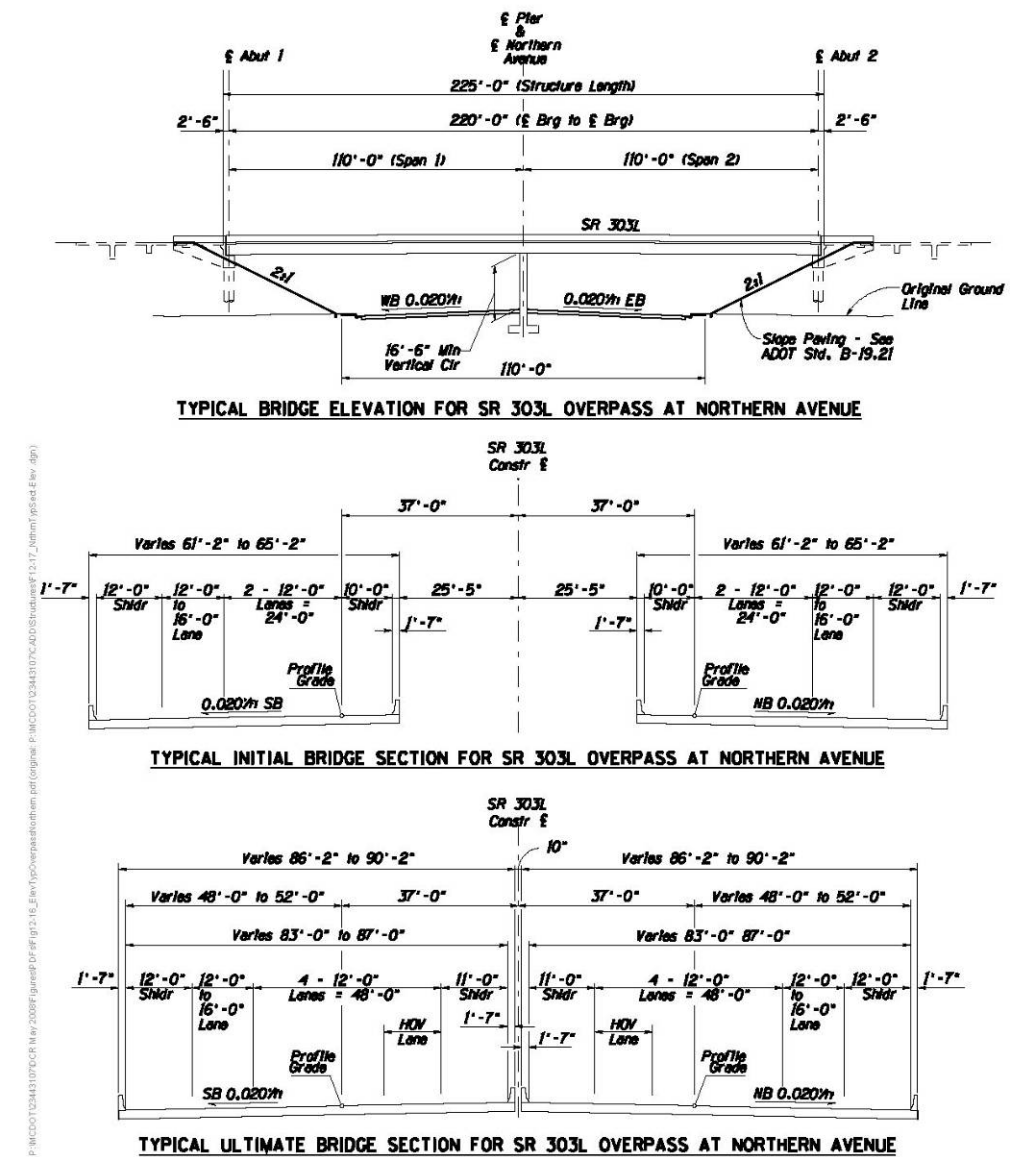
Elevation and Typical Section – SR 303L Overpass at Northern Avenue
